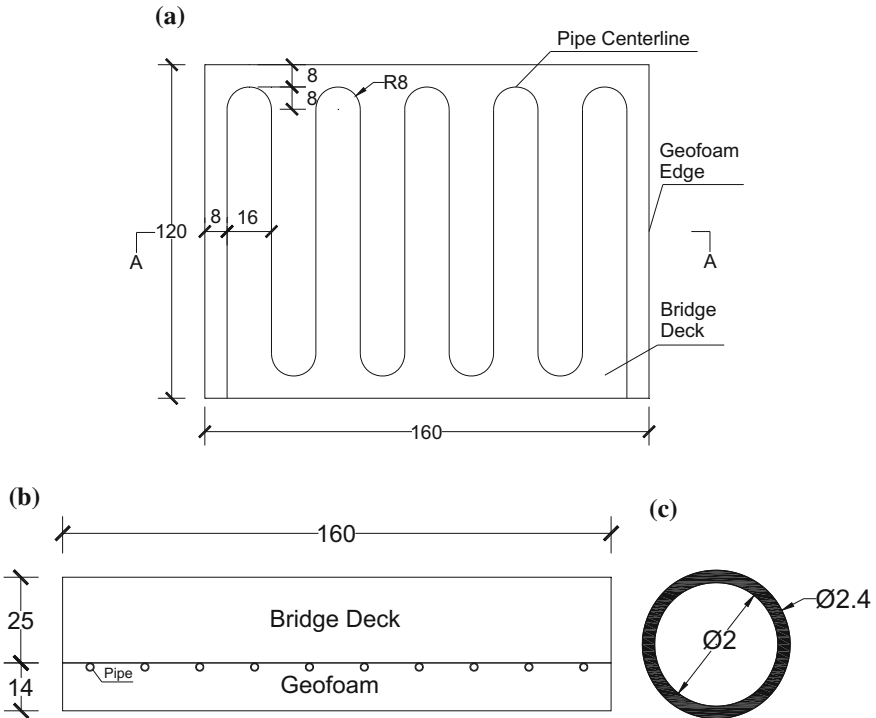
Bridge deck slab used in simulations and layout of the heating tube; a plane view; b A-A cross-section view; c cross-section view of tube (unit: cm)
